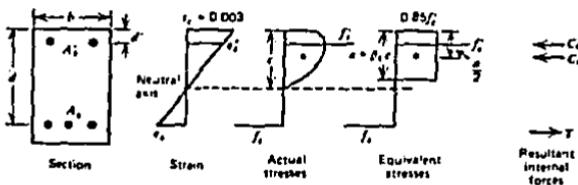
Doubly reinforced concrete section when the flexural strength is reached.
